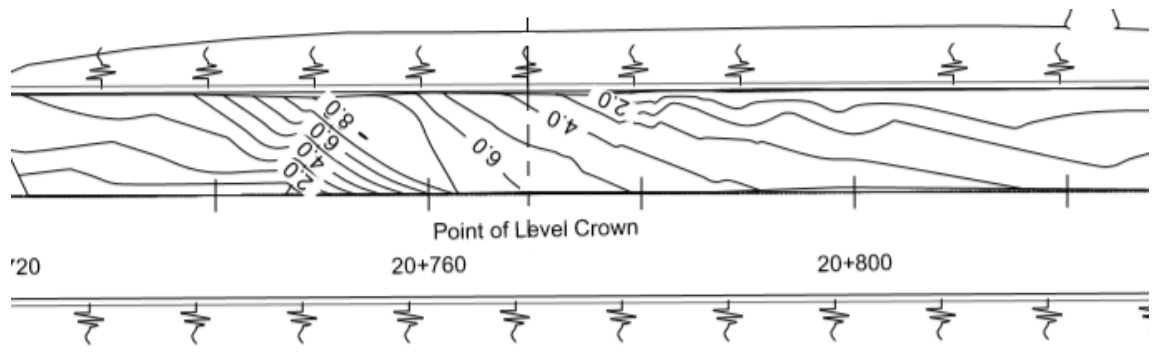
Contour plan of WFD for rainfall Intensity of 100mm/hr
